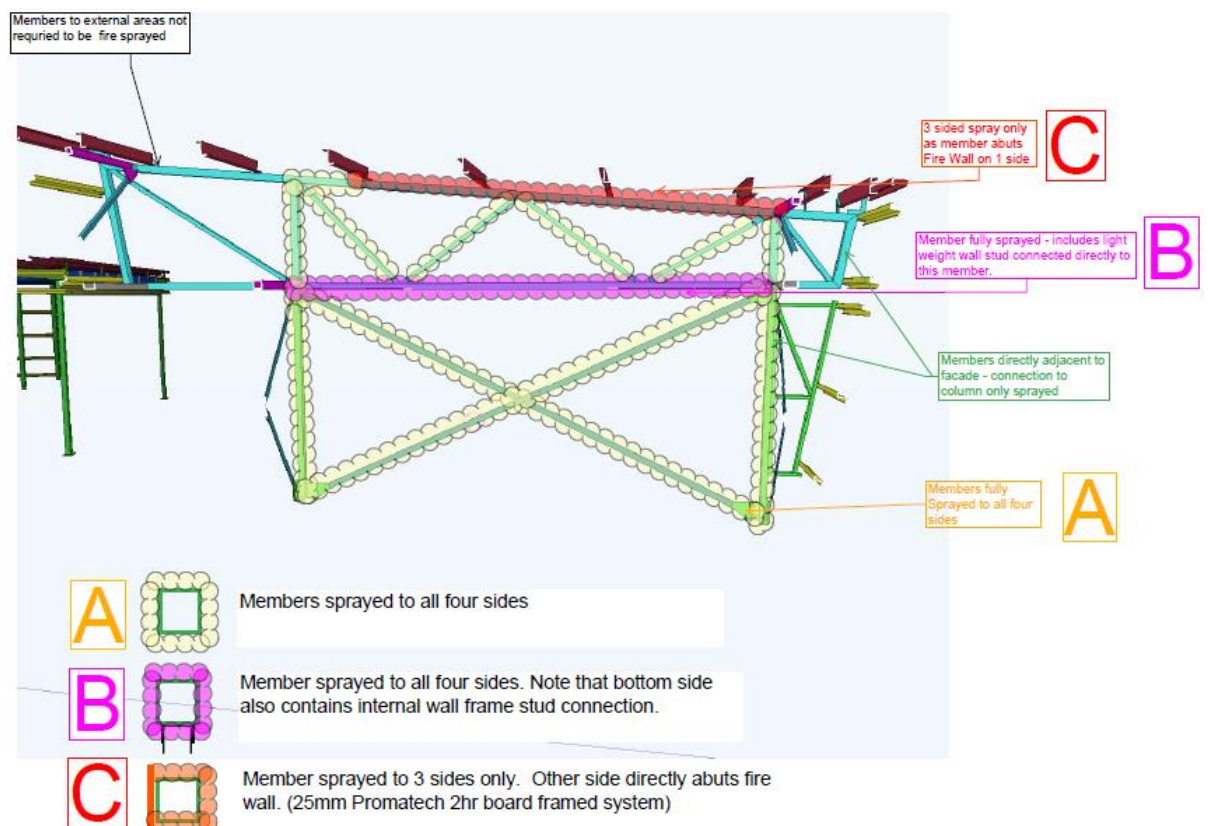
Proposed fire spray protection for IPU 1 & 3 steel members penetrating through fire walls
